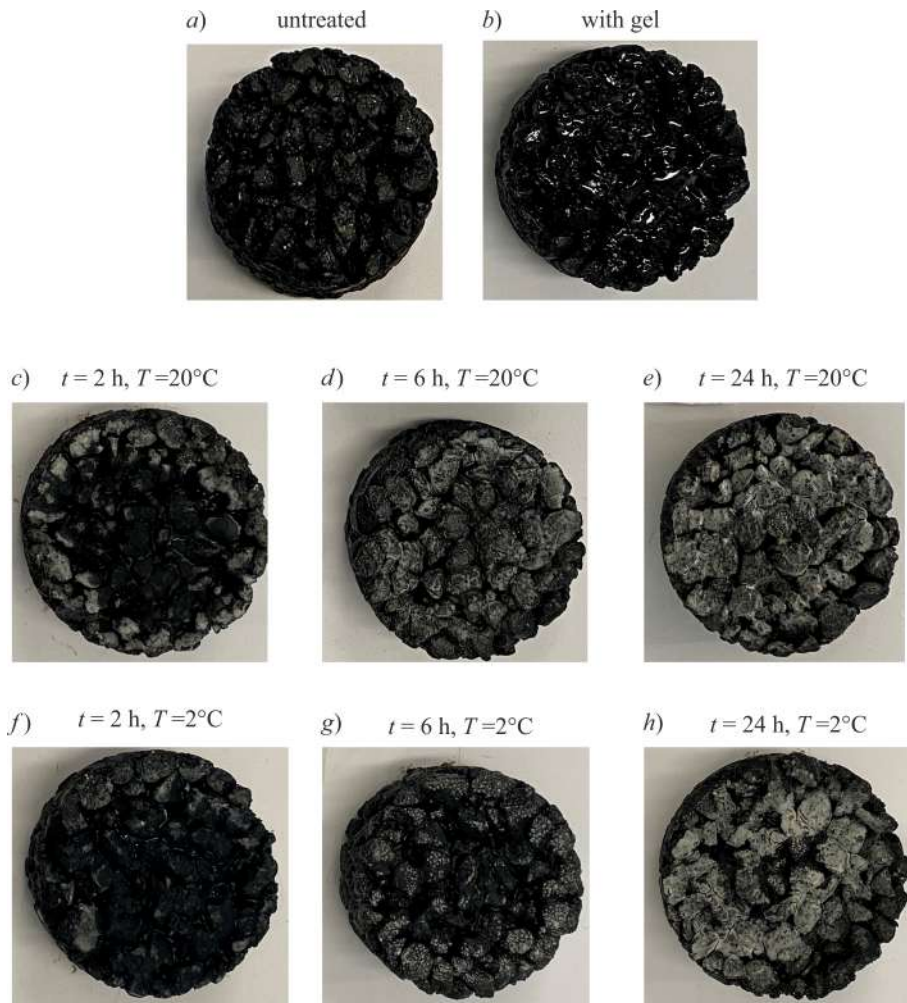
Photographs of the upper face of some specimens. *a)* Untreated specimen; *b)* specimens immediately after gel application; *c)-d)-e)* specimens stored at  $T = 20^\circ\text{C}$  after 2 – 6 – 24 h after the spray of the gel; *f)-g)-h)* specimens stored at  $T = 2^\circ\text{C}$  after 2 – 6 – 24 h.
